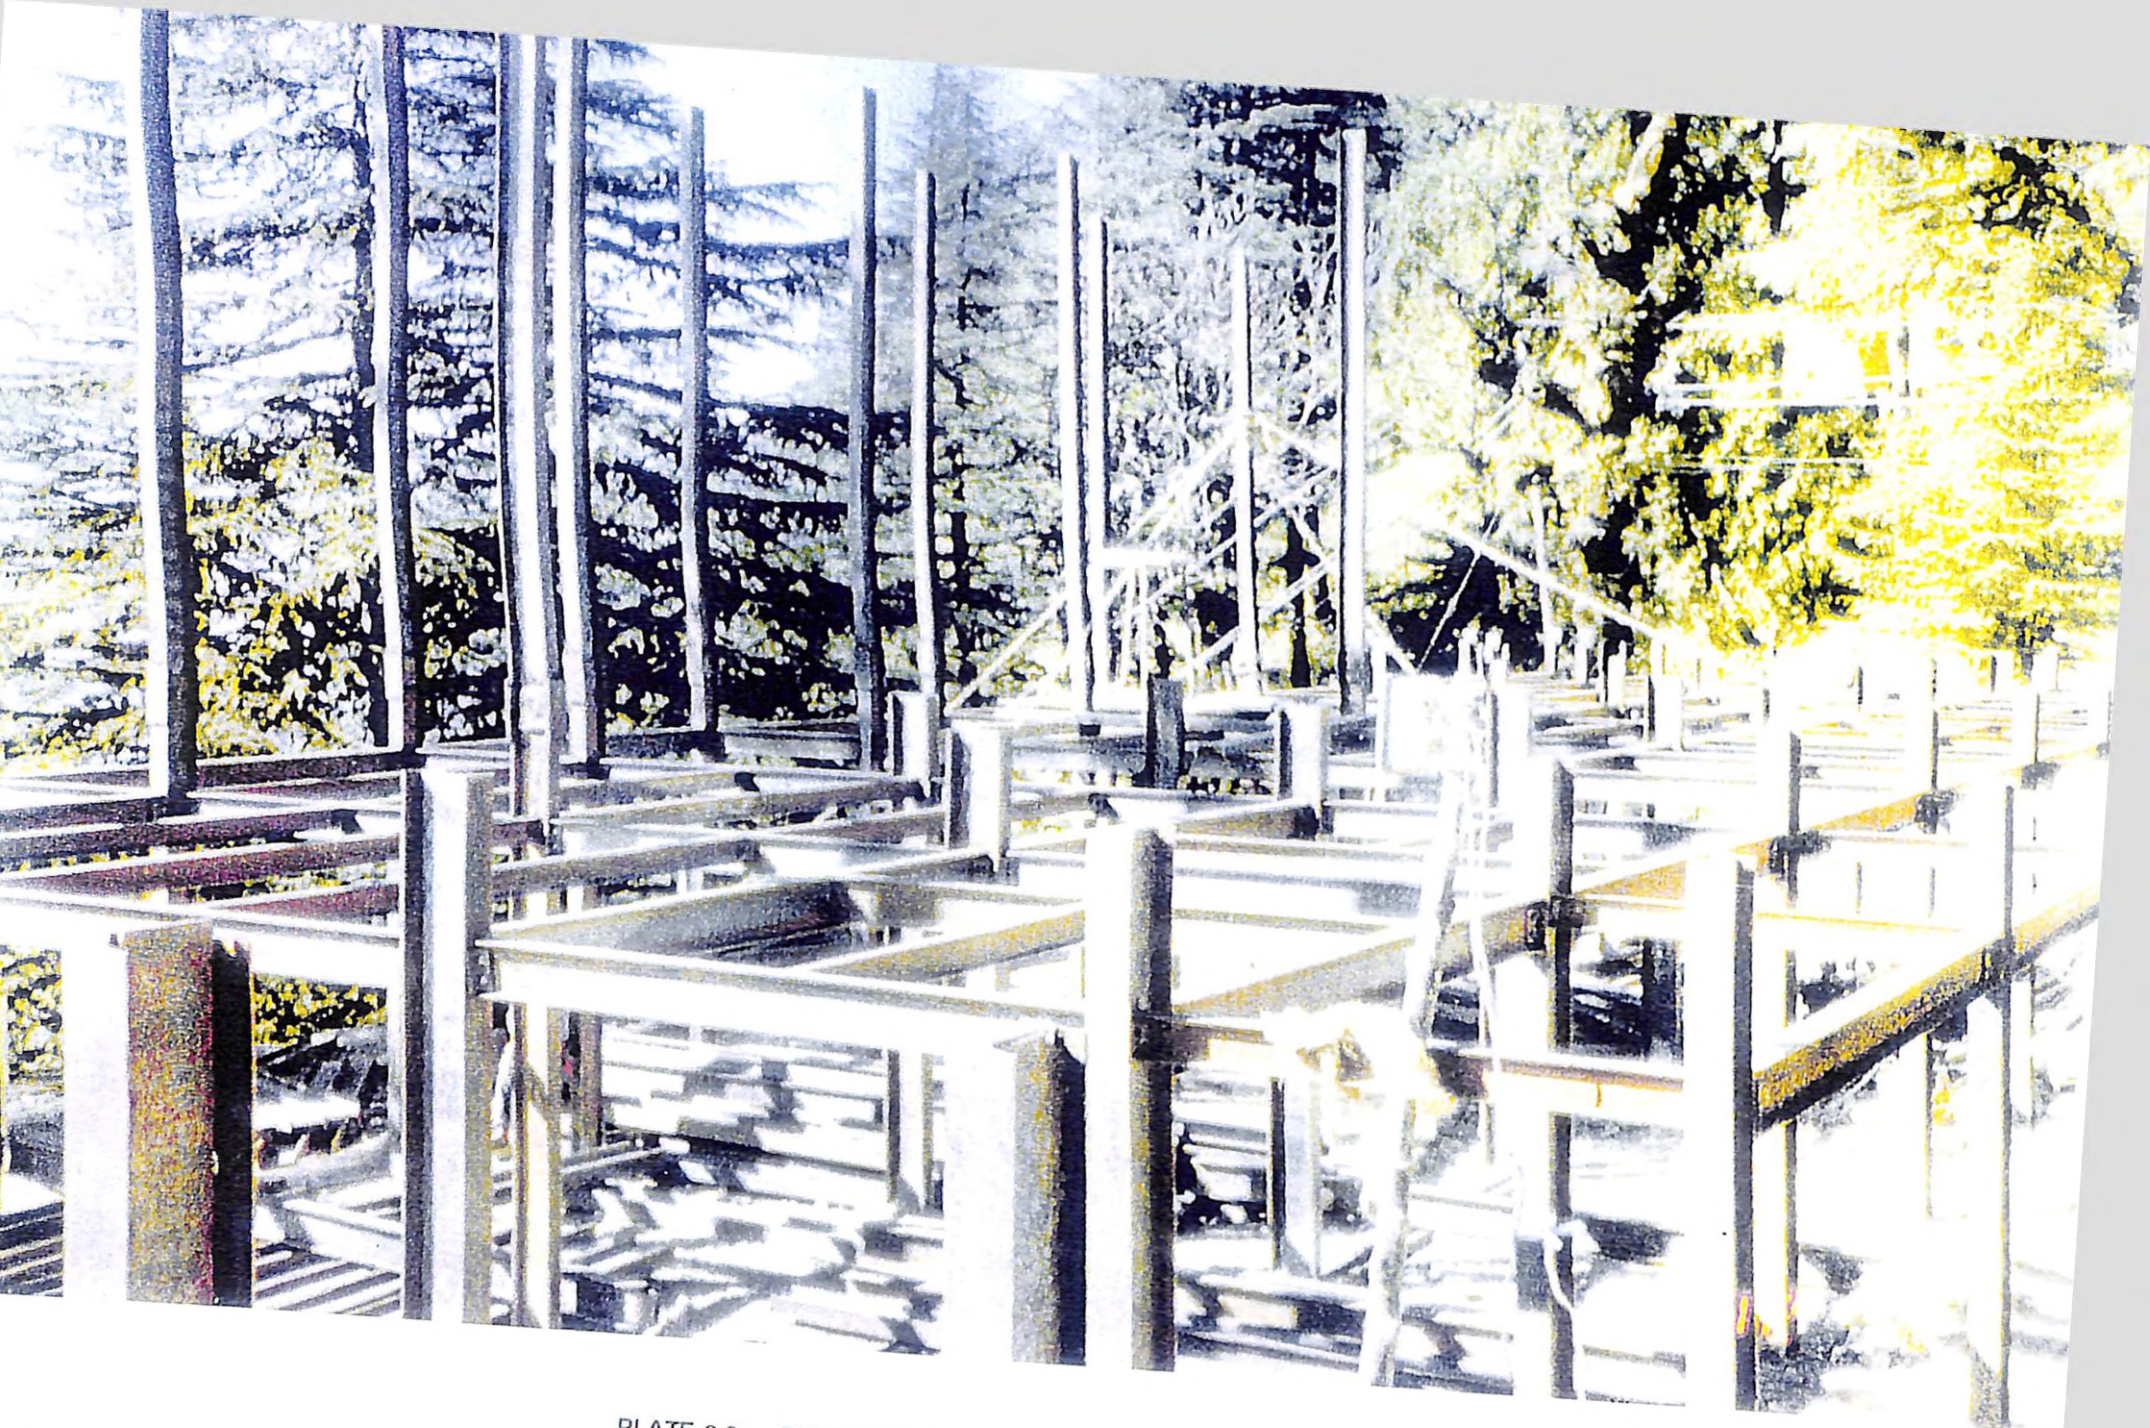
CONSTRUCTION JOINT DETAIL OF STRUCTURE
